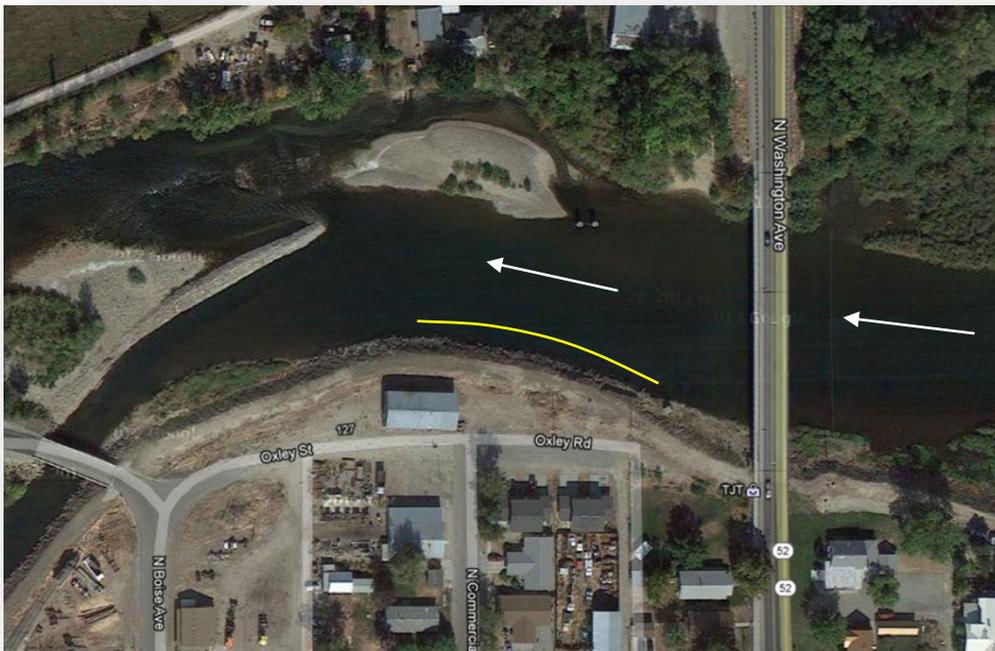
Emmett levee repair site located on the south shore of the Payette River 150 feet downstream from the North Washington Avenue Bridge in Emmett, Idaho.
